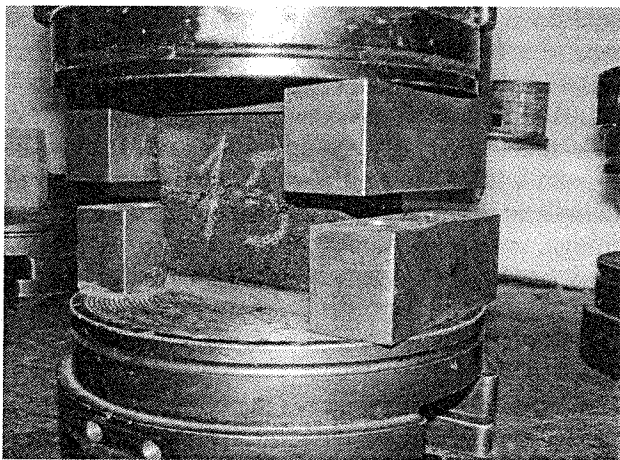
Test specimen used in shear adhesion test fitted in the machine platens.
